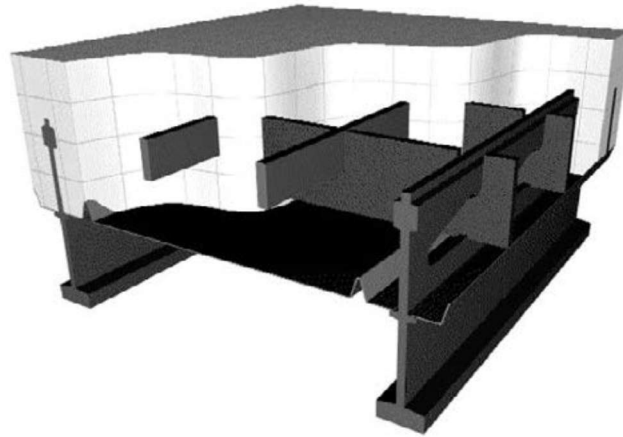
125 mm / 5" RB 1-2 Concrete Half-Filled Grid with Overfill (credit: LBFoster fabricated bridge products catalog)
